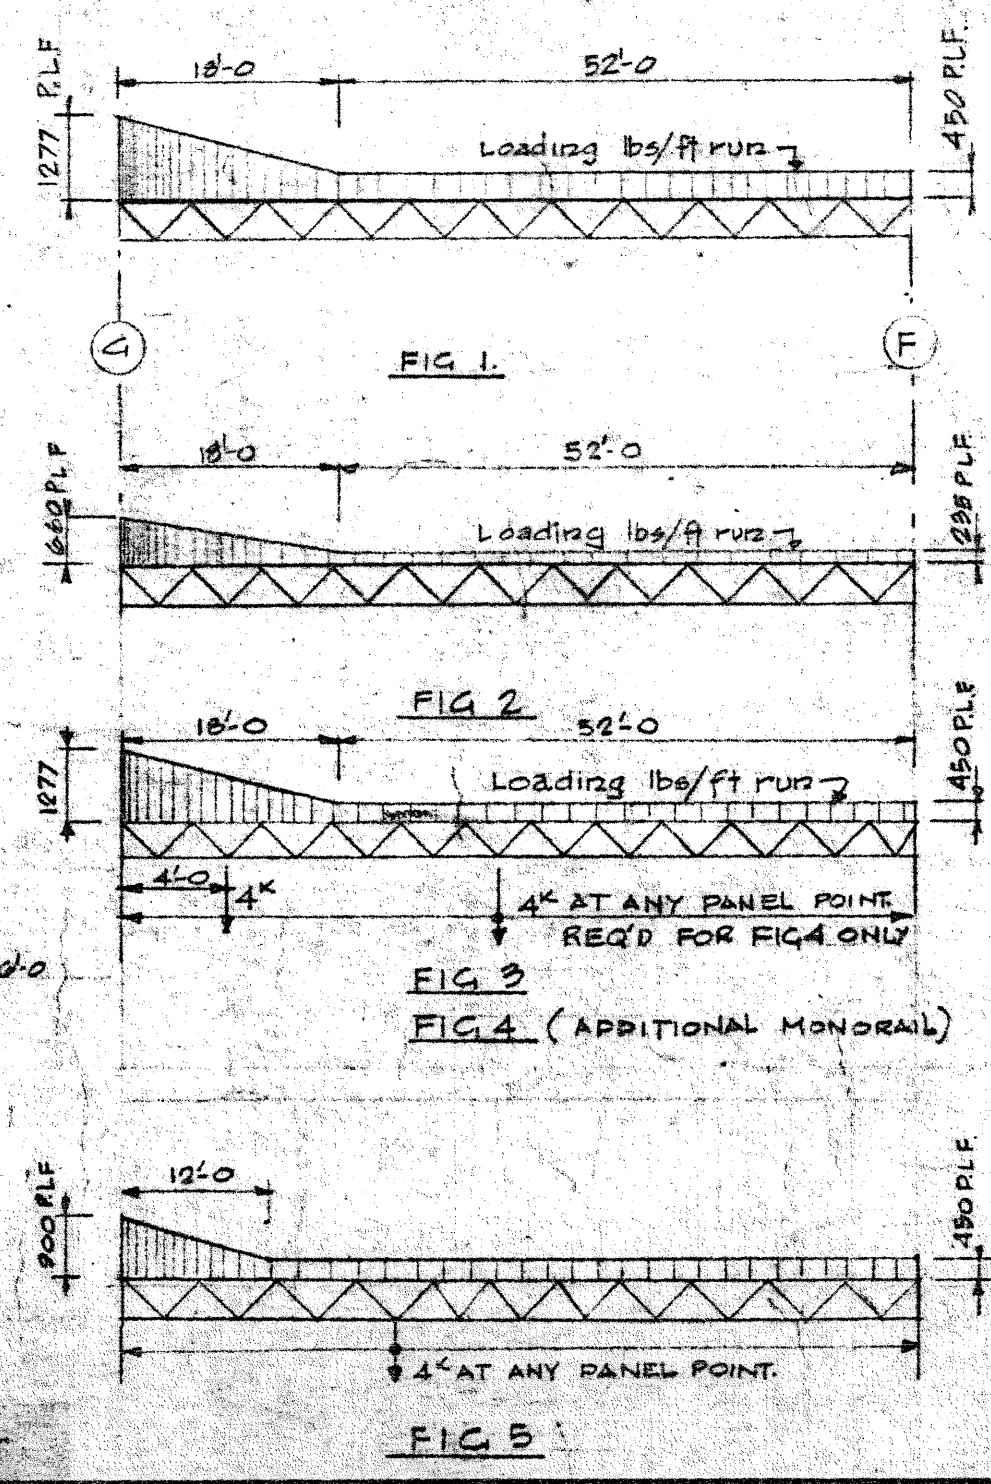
DETAIL OF TRUSS - SHOWING SIZES & FORCES
